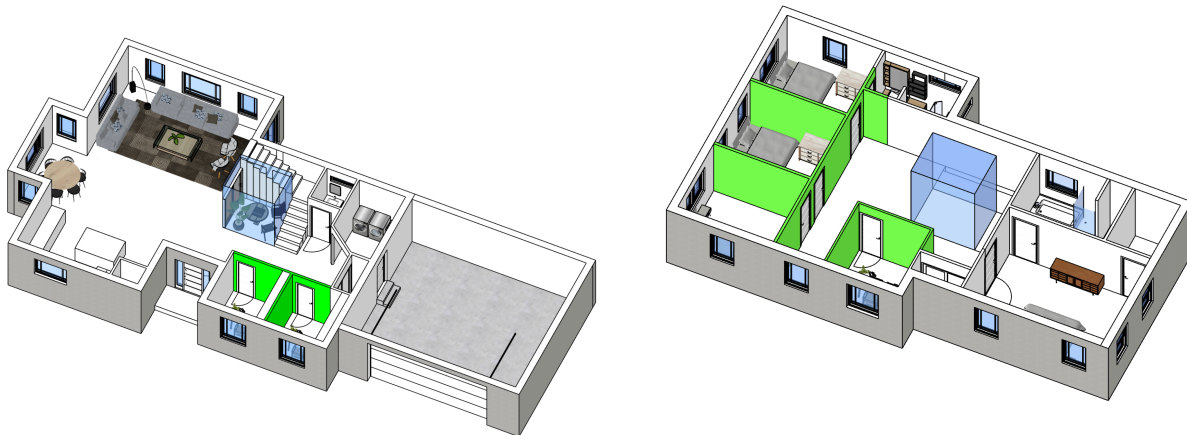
Pre-Flexibility Floor Plan - First Floor (Left)
